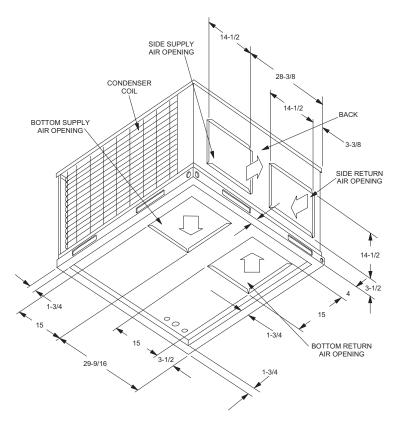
UNIT DIMENSIONS - BACK & BOTTOM
